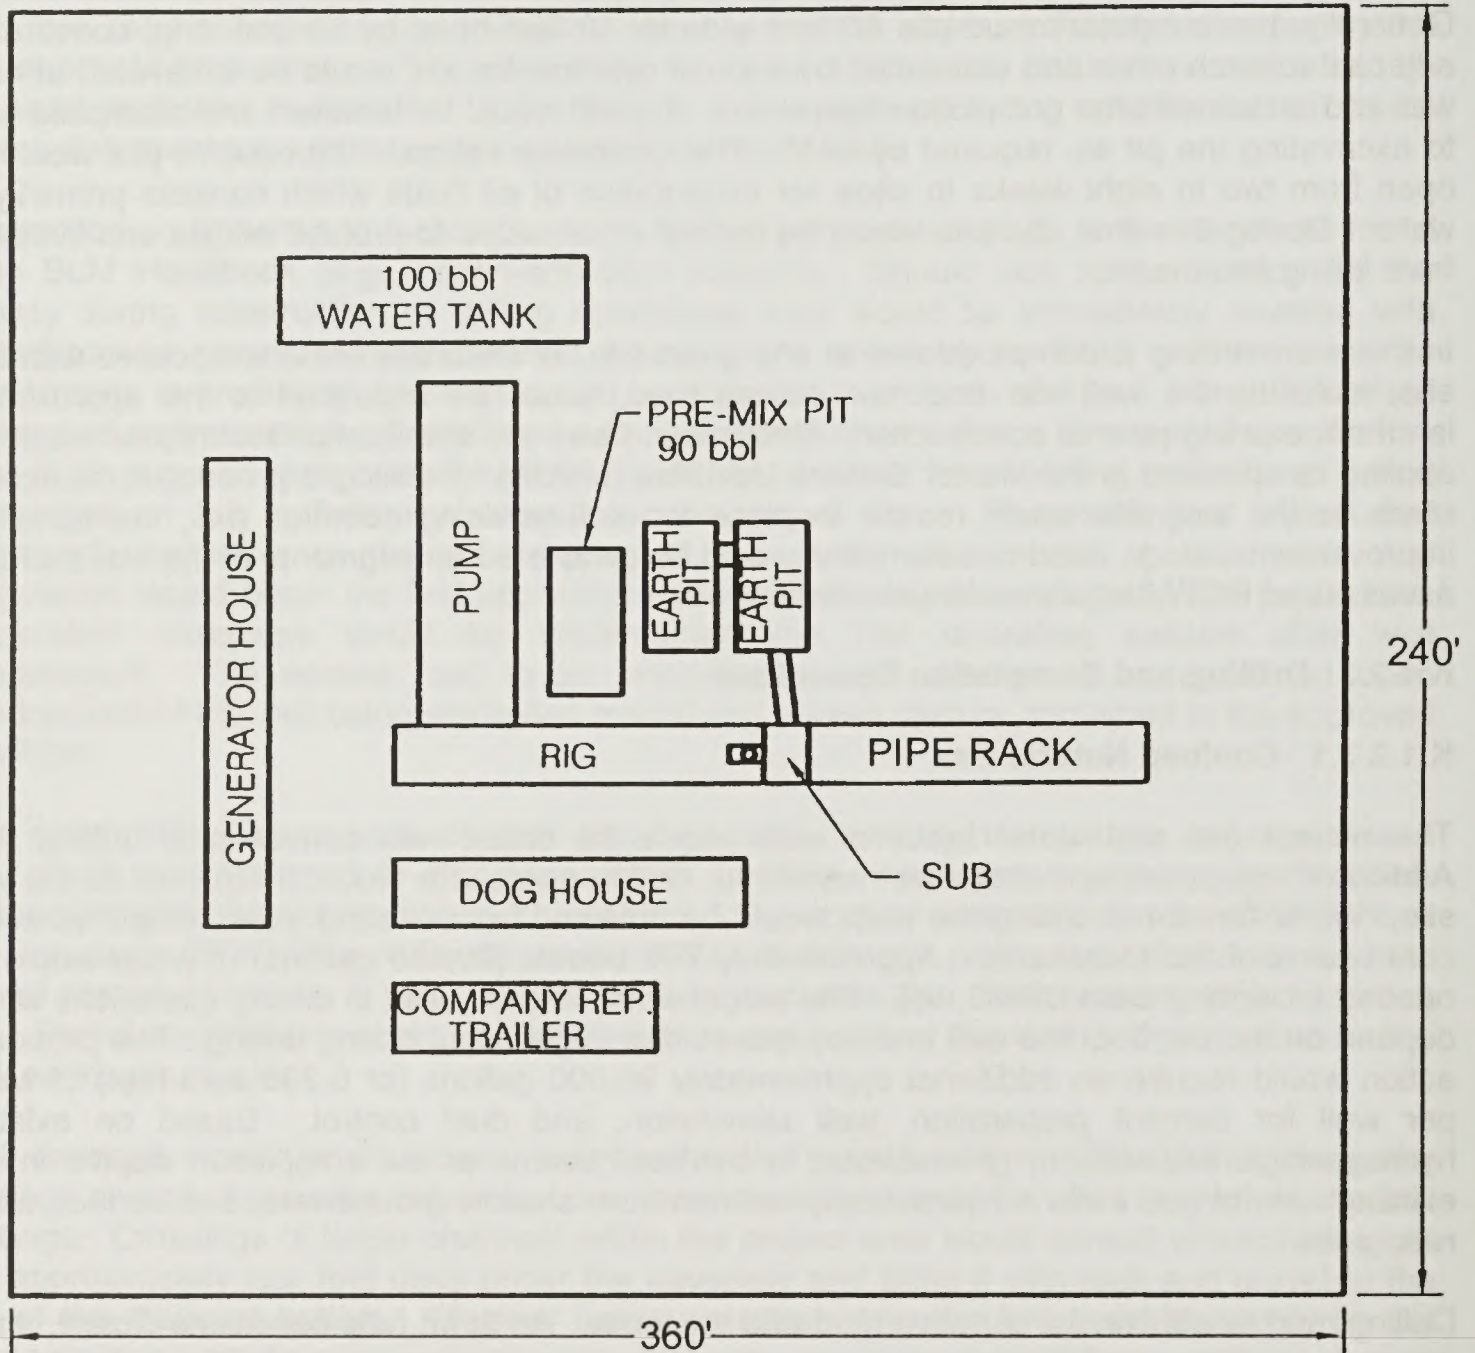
Typical Drill Site Layout – Atlantic Rim Natural Gas Project
